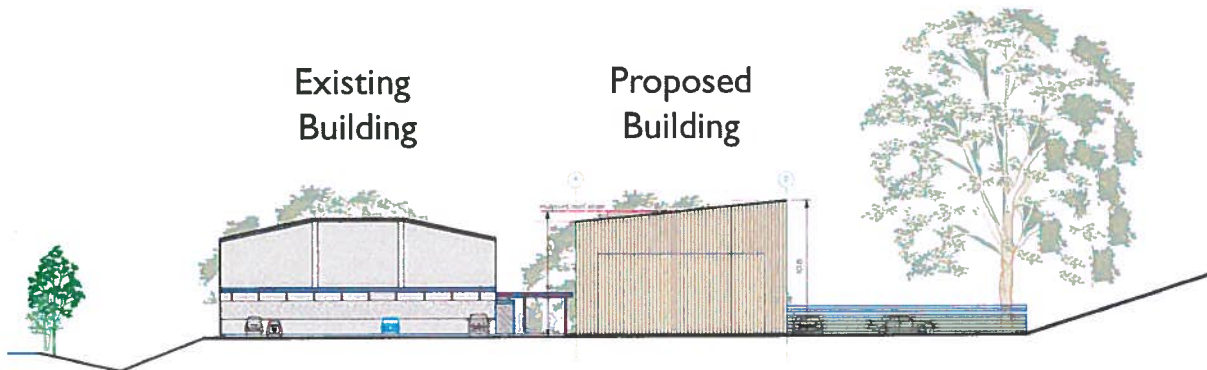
Streetscape Elevation – from Sutcliffe Road (from plans by Praxis Architects Inc.)
